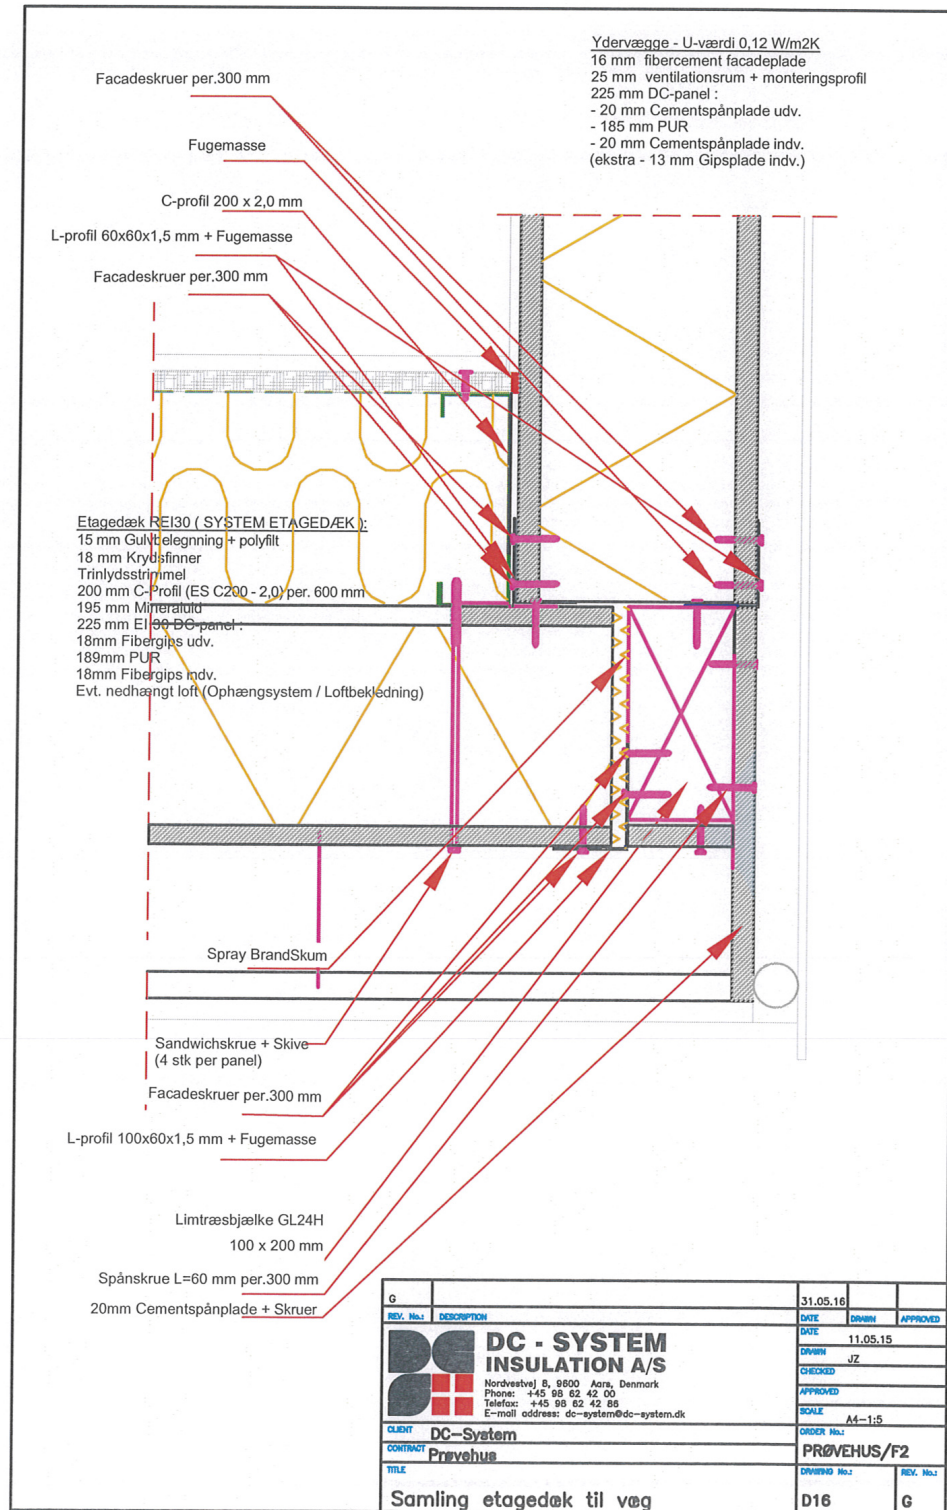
Detail: Wall-slab (Conference room). [DC-System, Test House (2015)]
